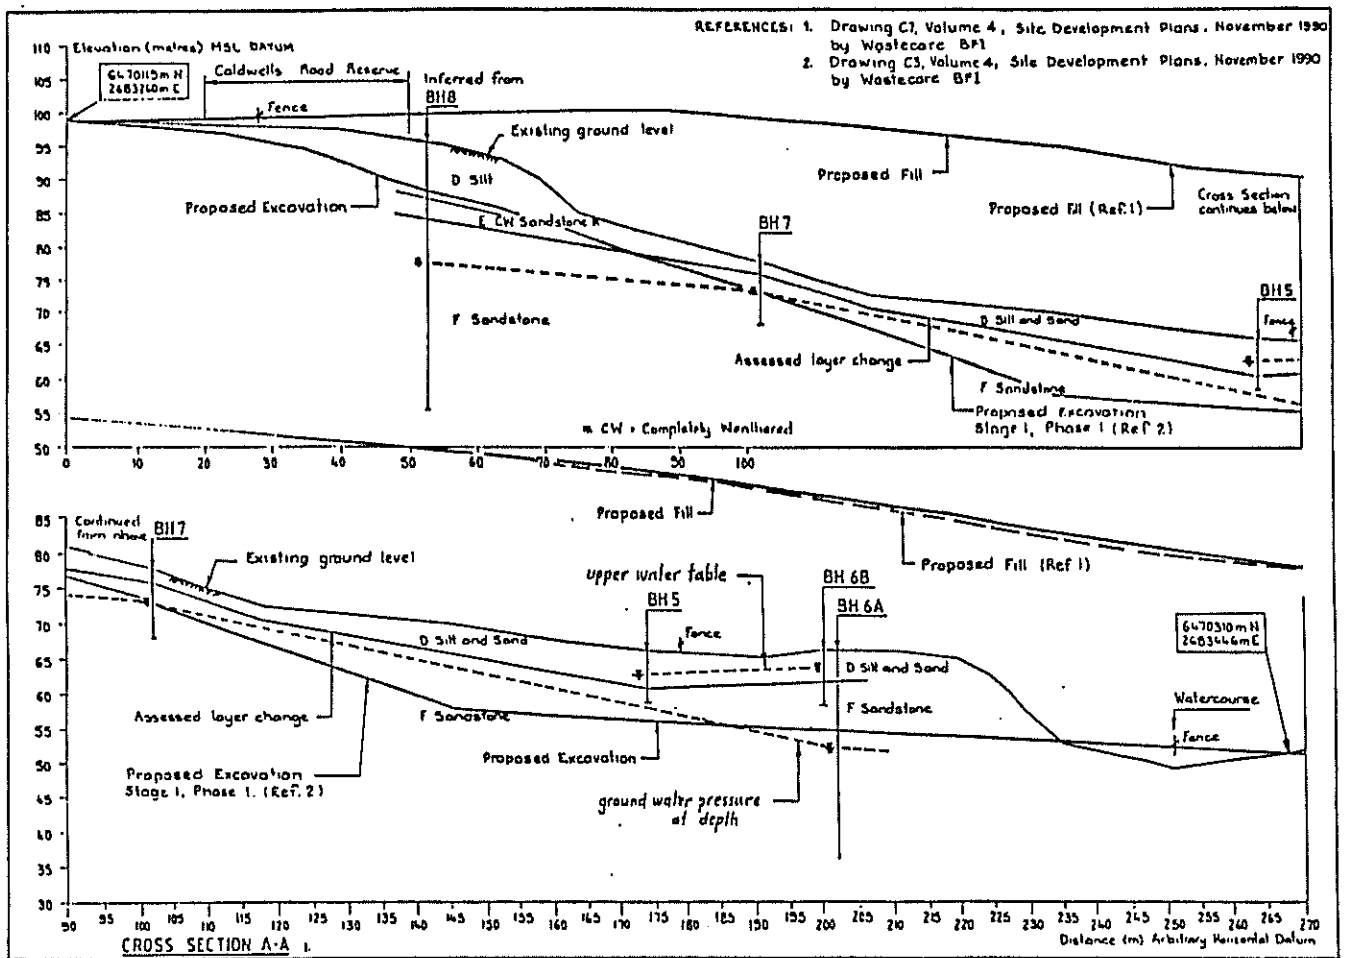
Cross-sections of Proposed Landfill Site at Whitford.
